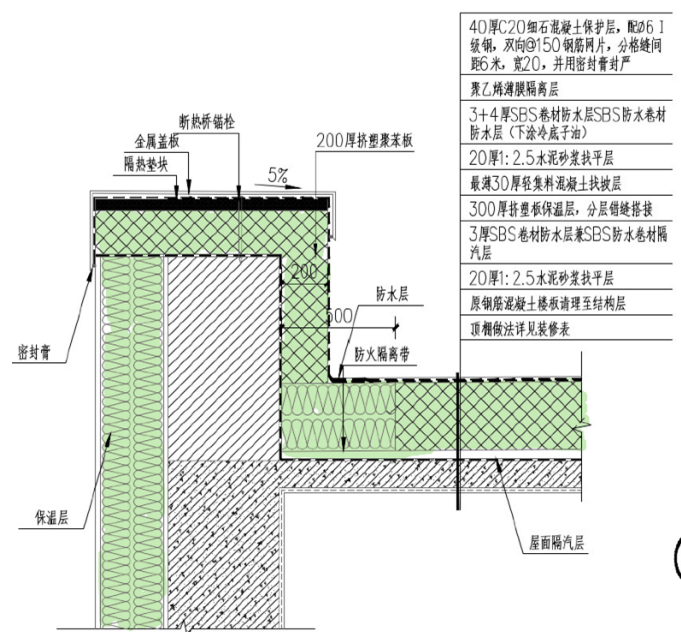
Detail of roof edge external thermal insulation, Source: Heilongjiang Cold Land Building Science Research Institute, Color-Marking: Zirkular
